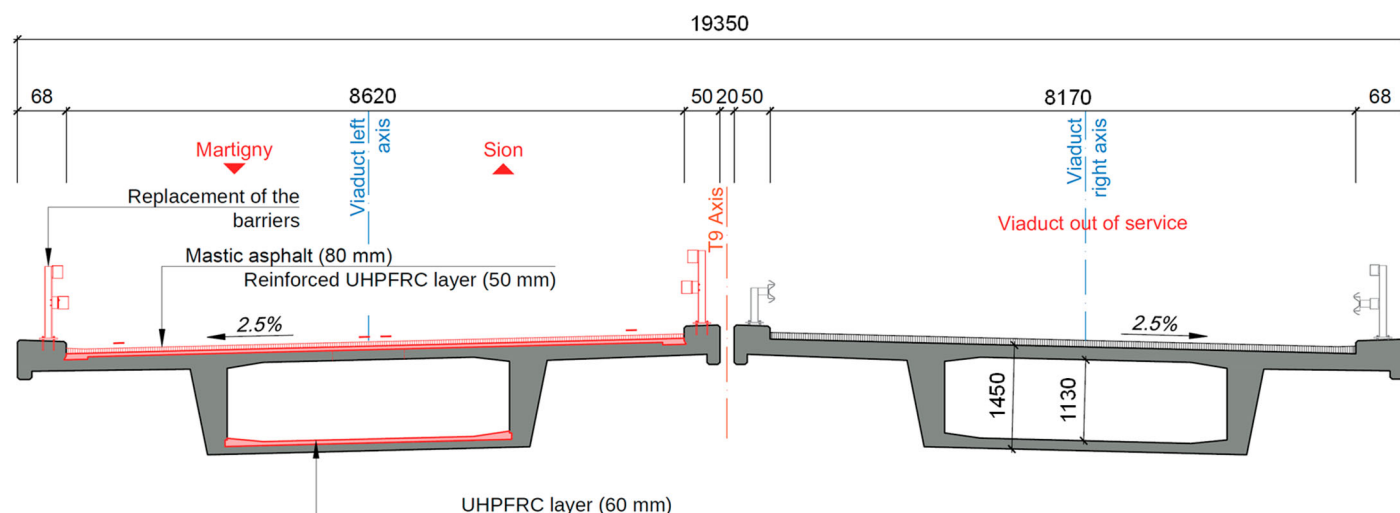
Left: box girder to which the intervention was implemented. Right: box girder taken out of service
